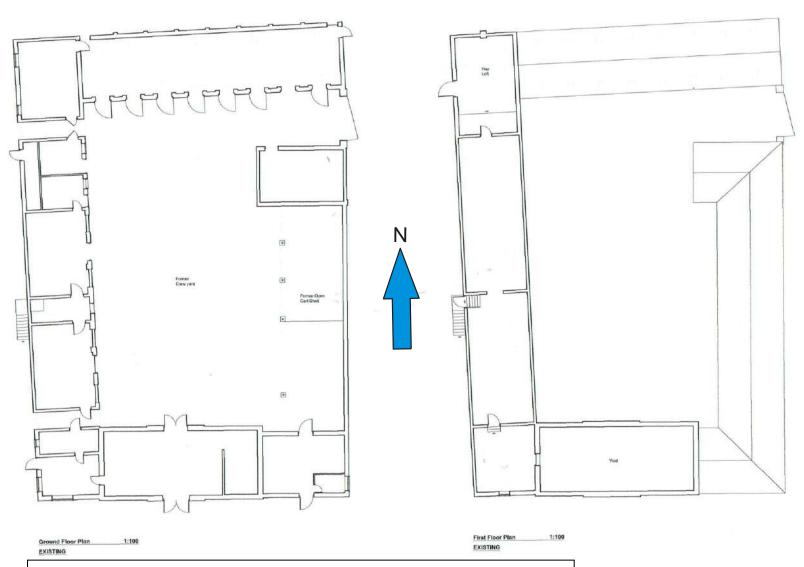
Plan showing the existing layout of the development site including ground and first floor plans at an original scale of 1:100, (not to scale), (extract from Architects plan)
